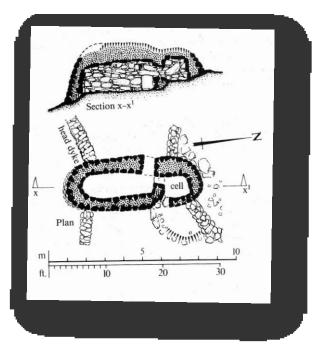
Plan and sectional elevation of Structure 155 (RCAHMS 1988).Inked drawing DC 10812 © RCAHMS
